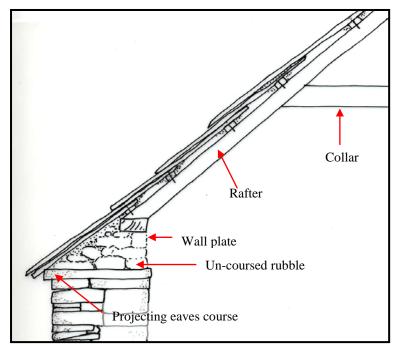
Partial section through stone slated roof showing eaves detail, collared rafter roof, wall plate, torching & courses
